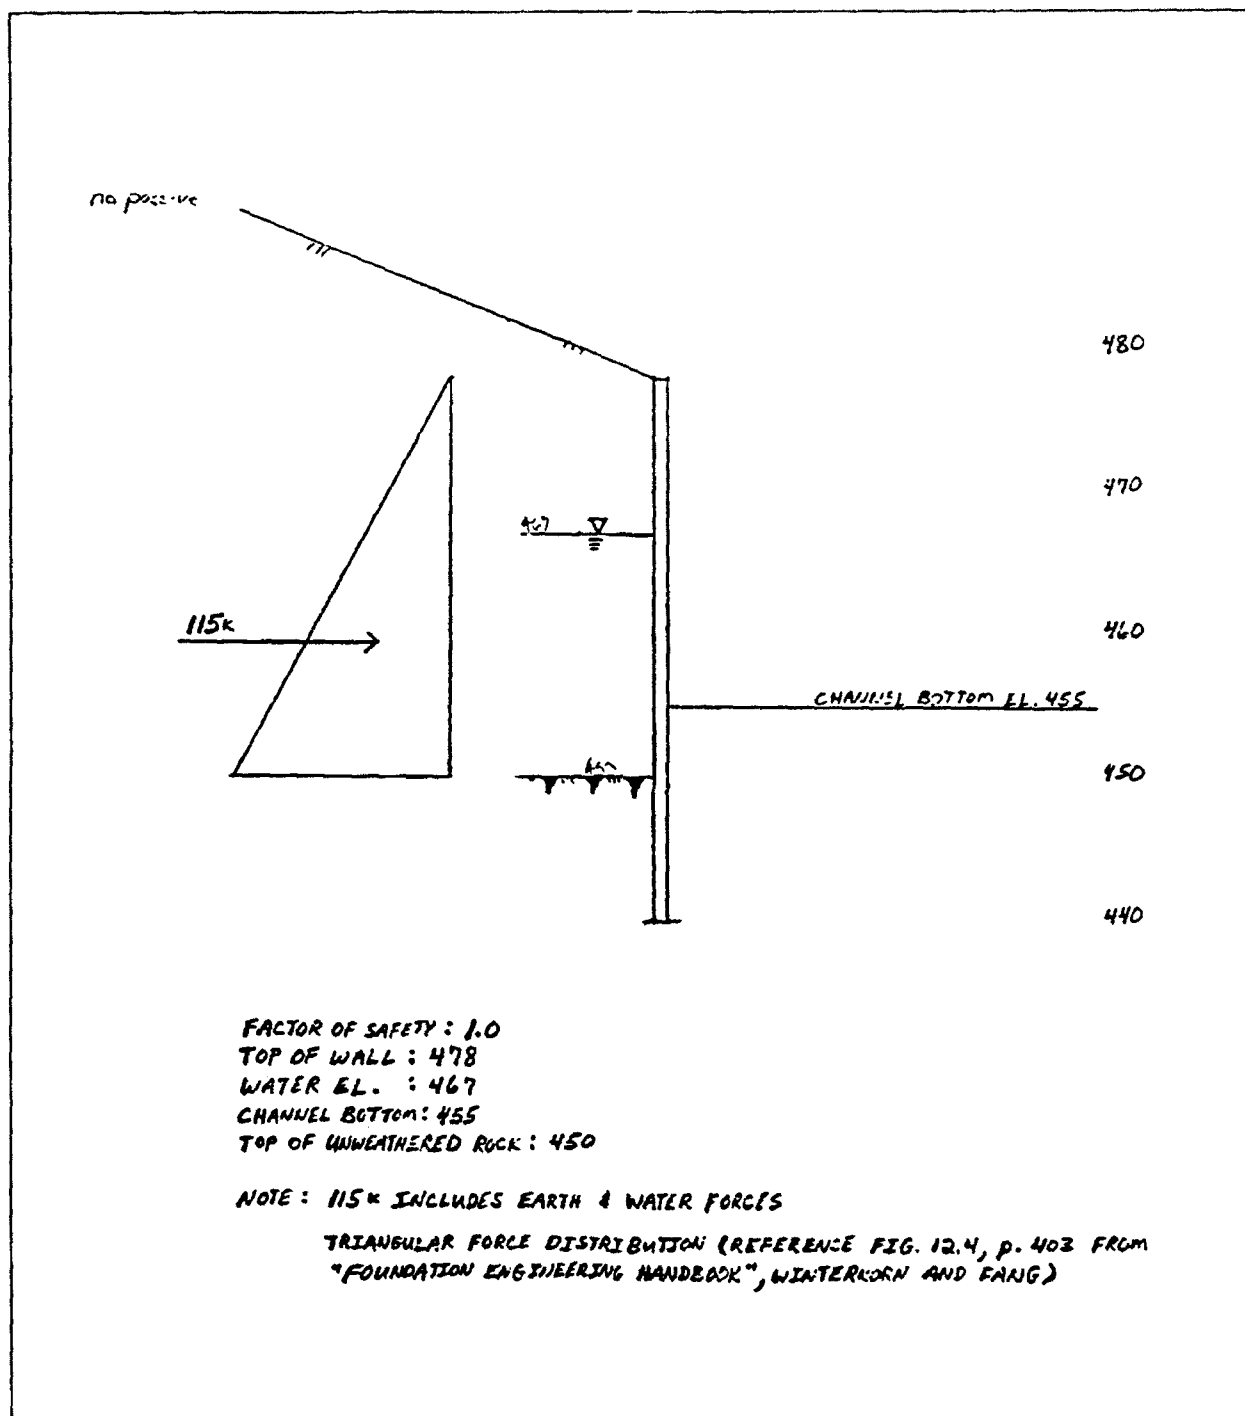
Mill Creek, Ohio, Section 1, tieback wall forces
